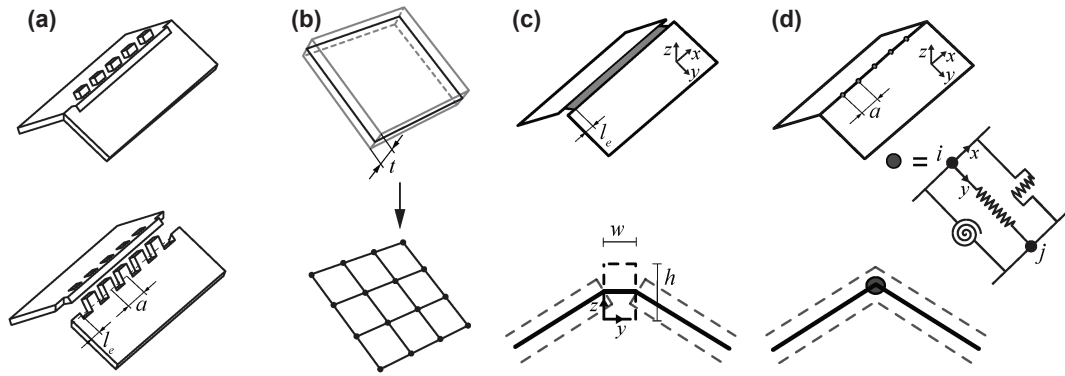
FE model: (a) Timber plates connected by TT joints / (b) Plate as shell element / (c) Connection as strip element / (d) Connection as spring element. Reproduced from [153].
